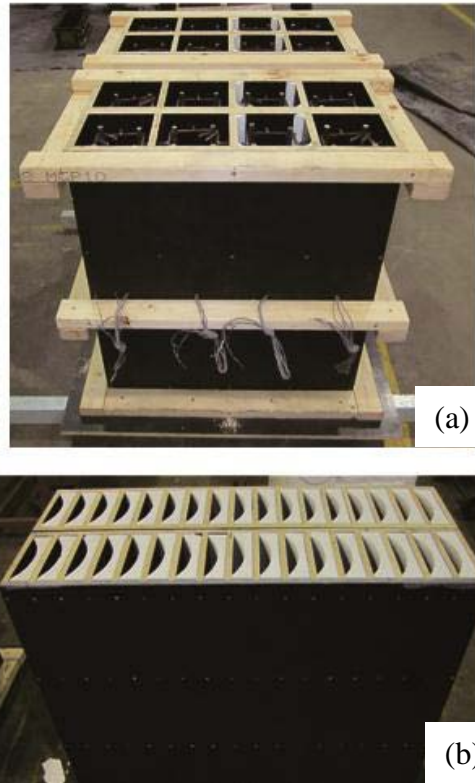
Details of the formworks for: (a) columns; (b) segmental circular covers
